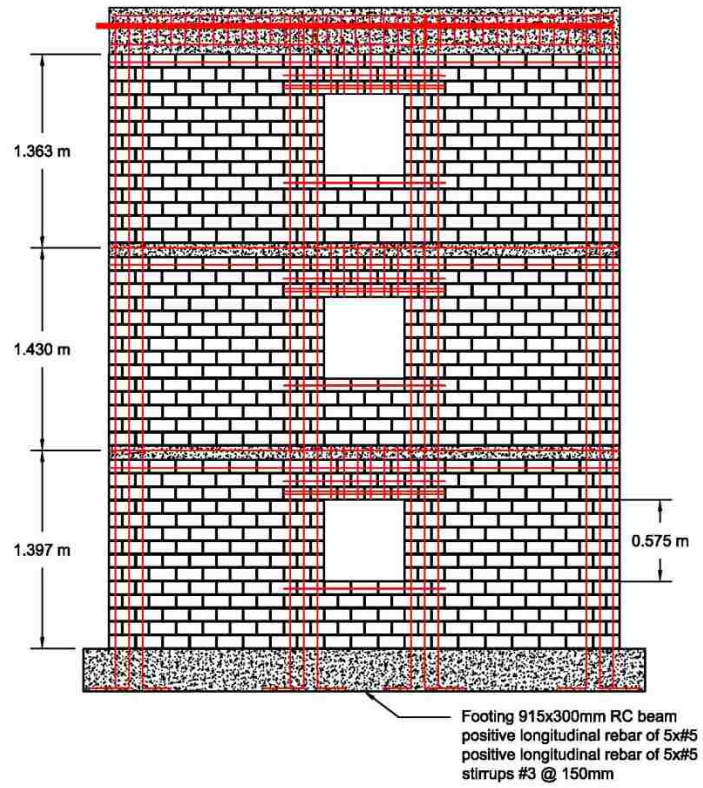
Geometry and Reinforcement Details Wall 4 and Wall 7.
